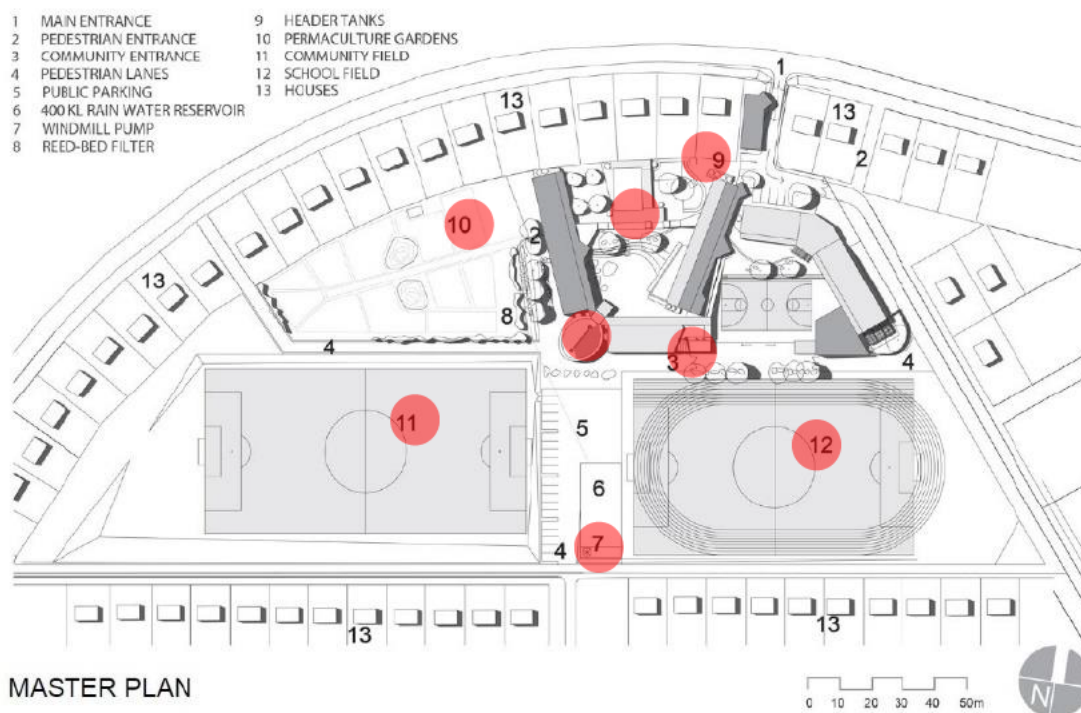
Site plan of Seven Fountains Primary School, Source: <https://www.eastcoastarchitects.co.za>, adapted by author
